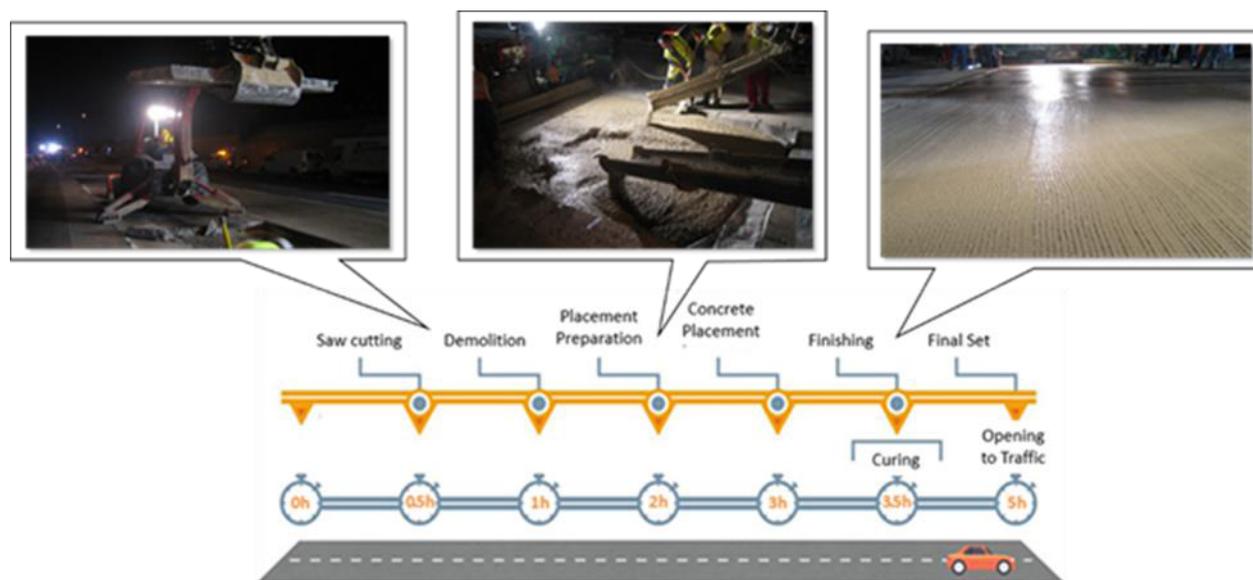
Timeline of a fast-track rehabilitation for a highway concrete pavement using BCSA cement.
